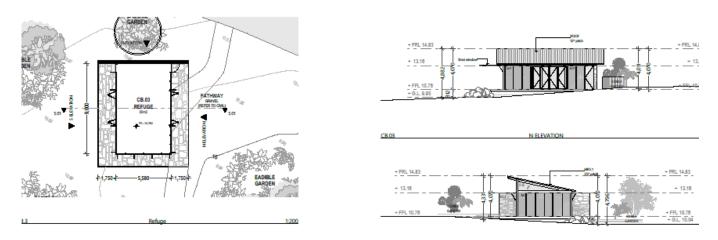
Bush Fire Refuge building (CB.03 – Onsite Evacuation Building, Revision 14, 29/07/2022).
